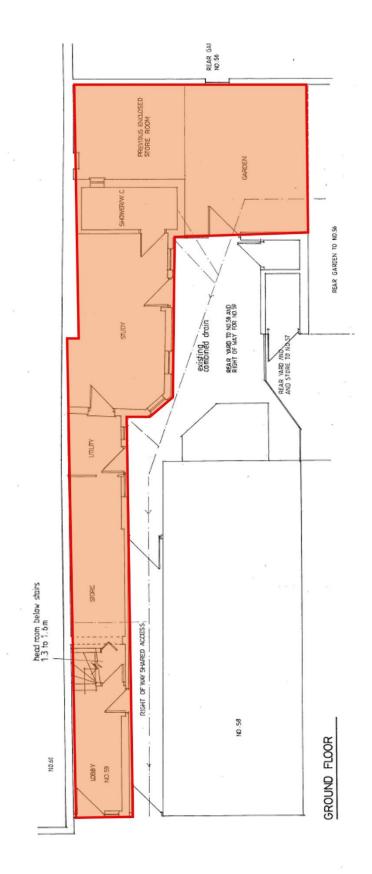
59 St Dunstan's Street, existing ground floor plan.
